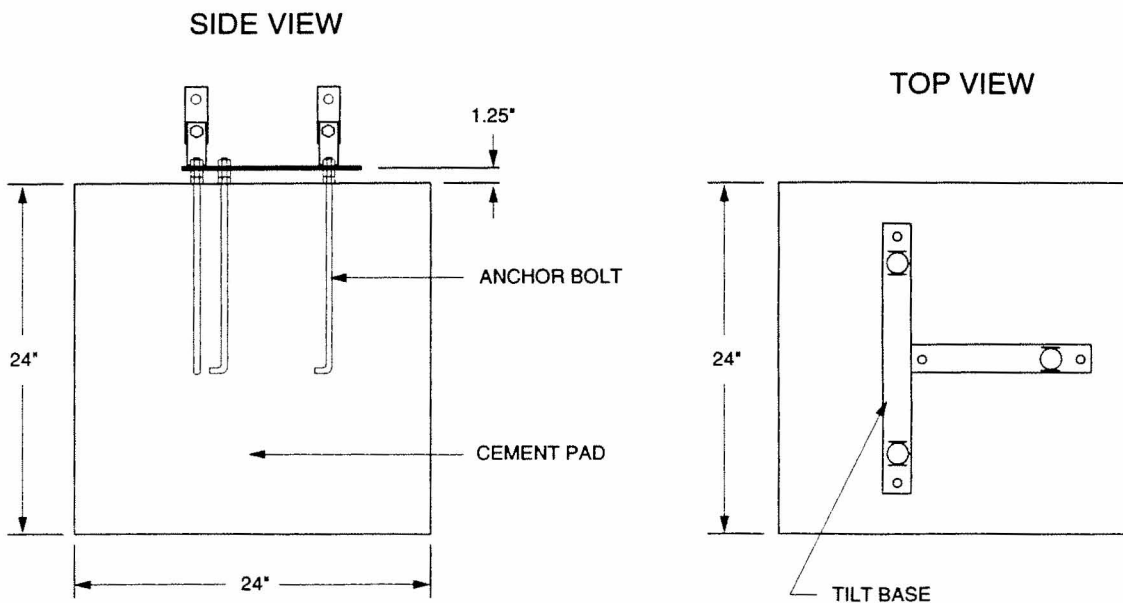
Concrete Foundation and Anchor Bolts
